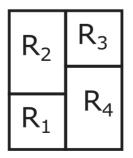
A best connected rectangular floor plan for 4 rooms.
